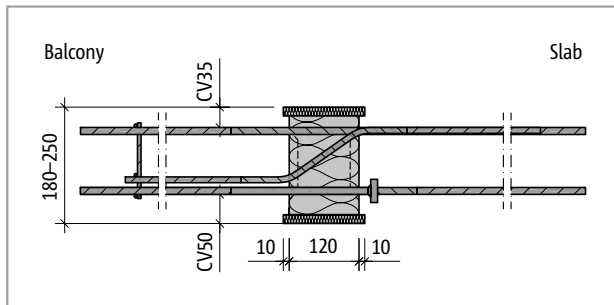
Schöck Isokorb® XT type C-L-CV35: Product section
